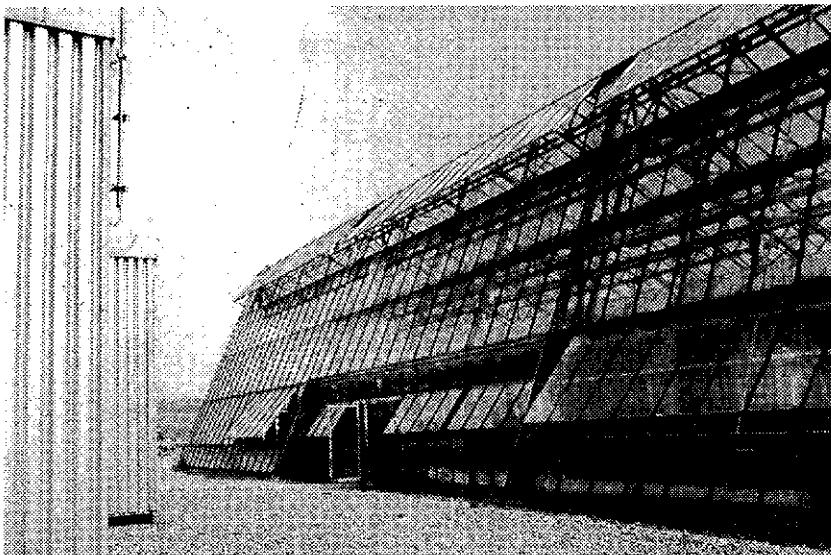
View to the West facade of the atrium taken from the roof of the existing old office building.
